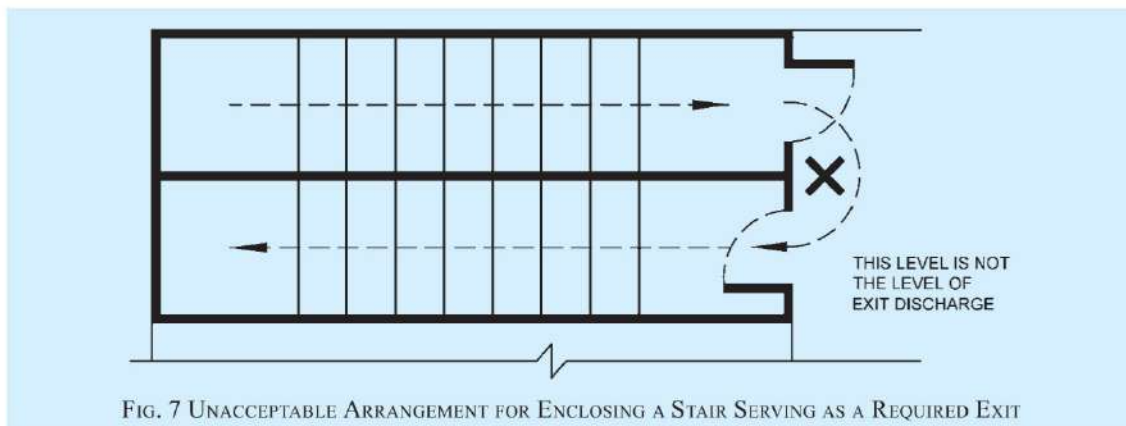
UNACCEPTABLE ARRANGEMENT FOR ENCLOSING A STAIR SERVING AS A REQUIRED EXIT
